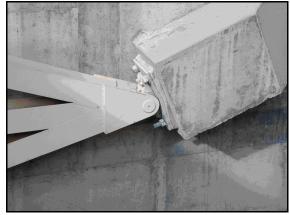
Radial Gate No. 1, left arm assembly. Note the bent bearing plate, the bearing grout pad, and the concrete corbel support.
